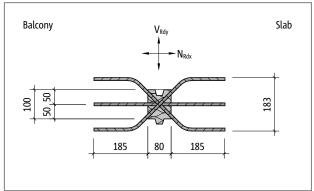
Schöck Isokorb® T type H-VV1-NN1: Product layout
